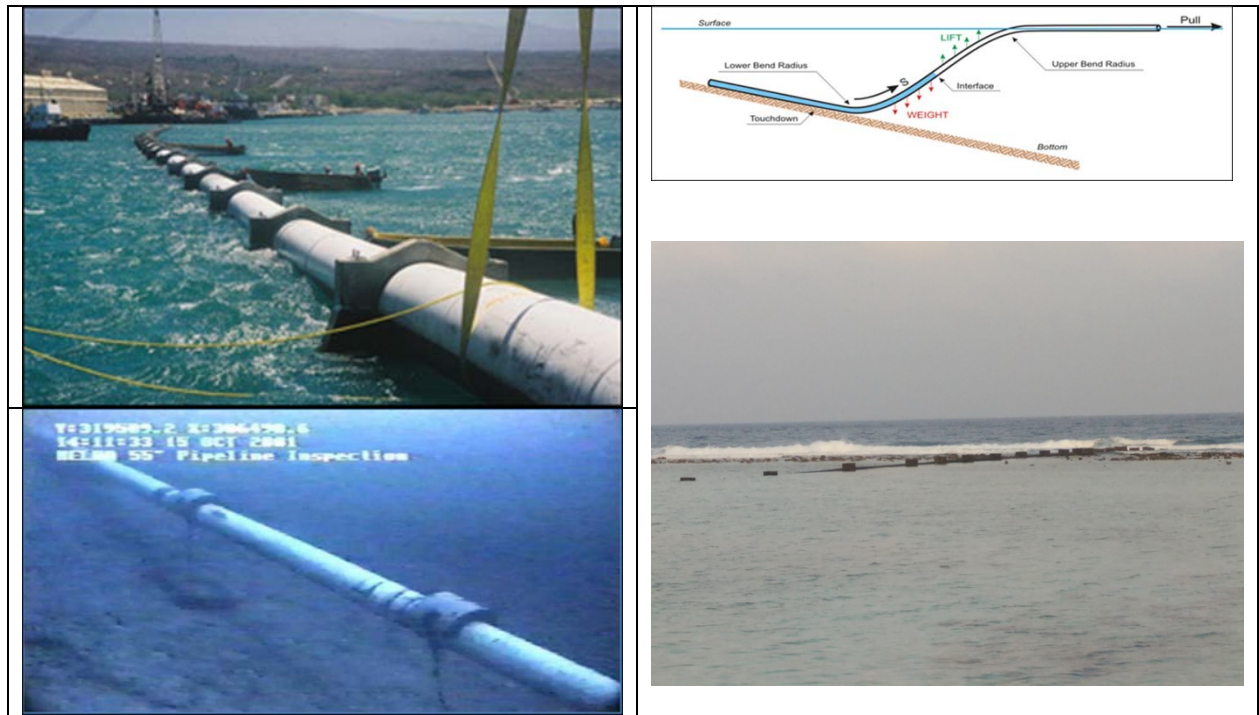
Cold seawater intake pipe lying procedure: TOP LEFT; Sea water pipes assembly in shallow lagoon, TOP RIGHT; pipes laying procedure in the trench, BOTTOM LEFT; pipes correctly installed at sea bottom. BOTTOM RIGHT; similar but shallower installation in Hulhumale eastern side (sewerage pipe)
